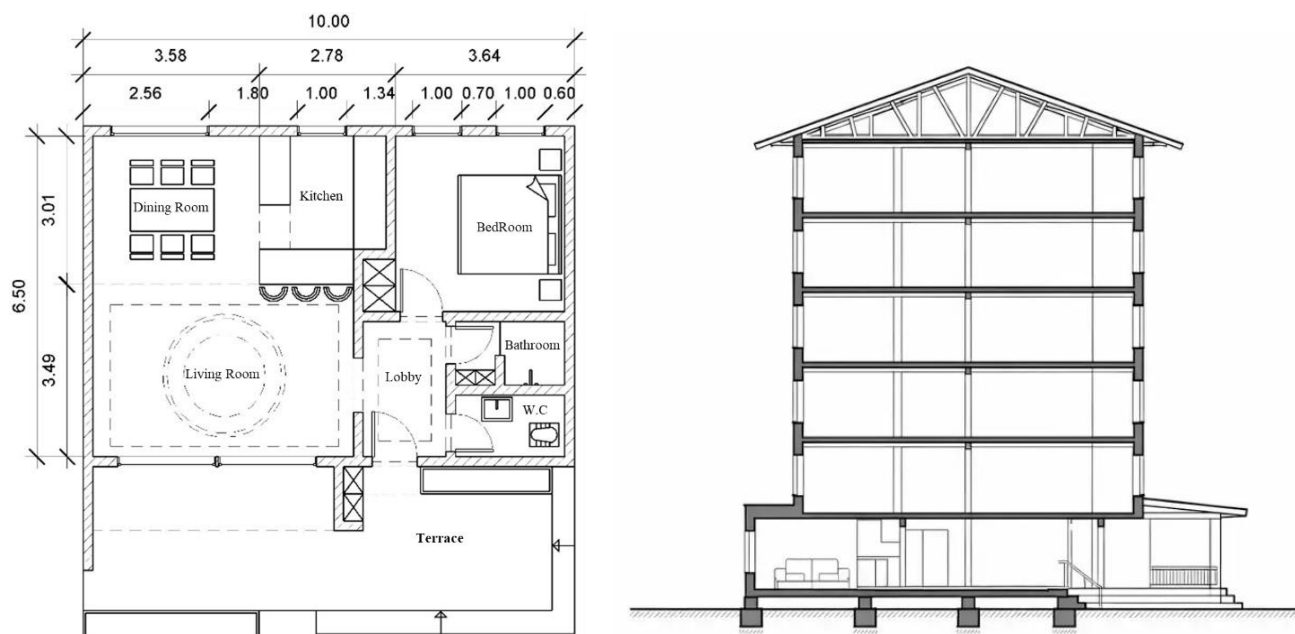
Plan and Section of the Case Study Building (Source: Authors)
